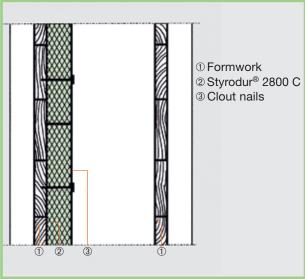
Fixation of Styrodur® 2800 C boards to wood formwork with clout nails.
